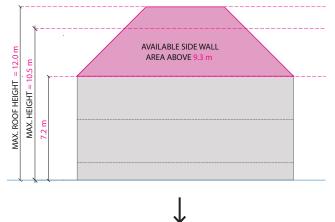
SIDE ELEVATION SHOWING MAXIMUM SIDE WALL AREA WITH TRANSITION
